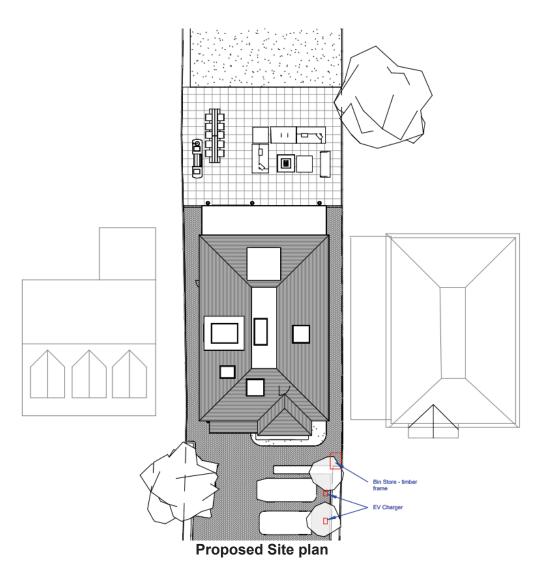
Proposed Plan (please note – larger version of plan can be found in the Committee Plan Pack)
